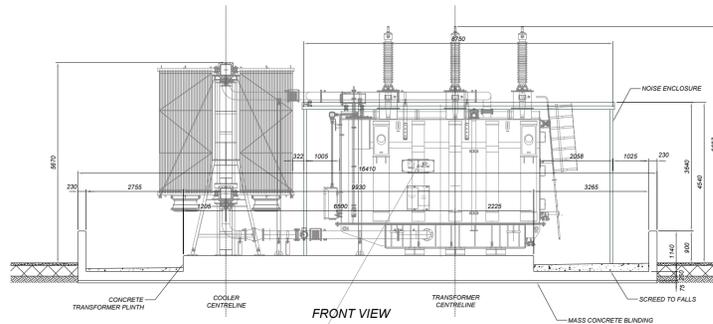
PV-ENG-0-460-R00-5.15
